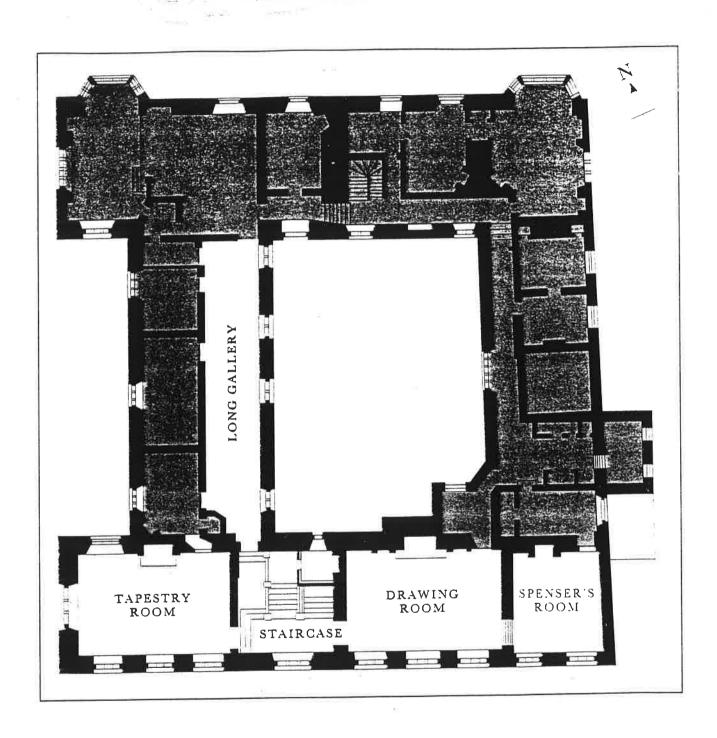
First floor Plan (From The National Trust Guide to Canons Ashby)
